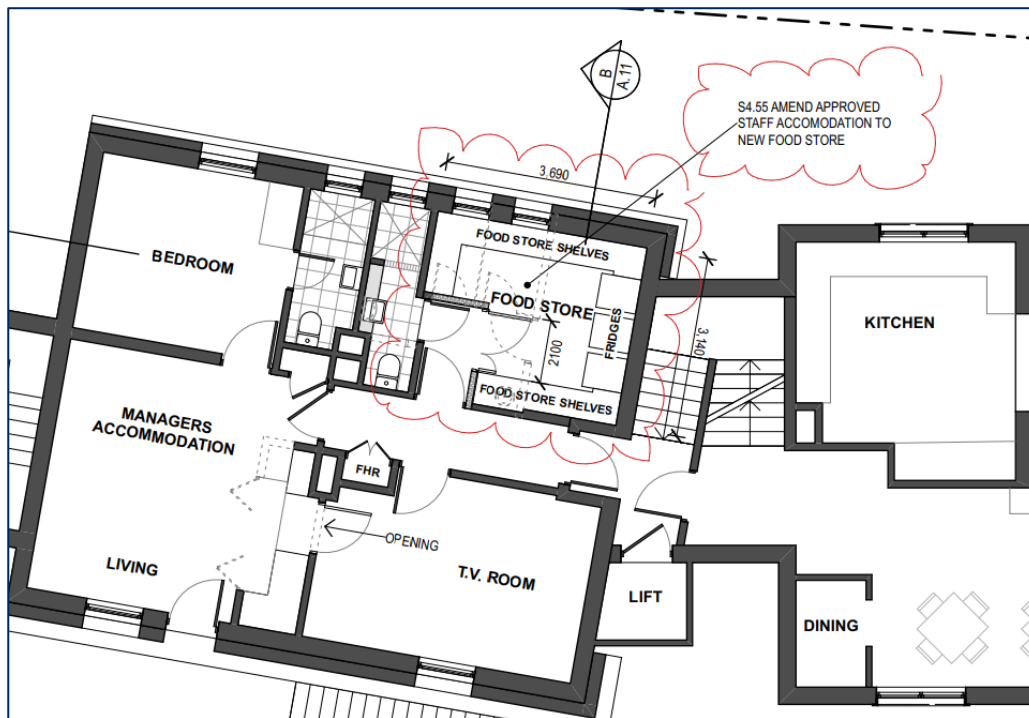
| Level 2 food storage room modification (Source: Applicant's documentation)
